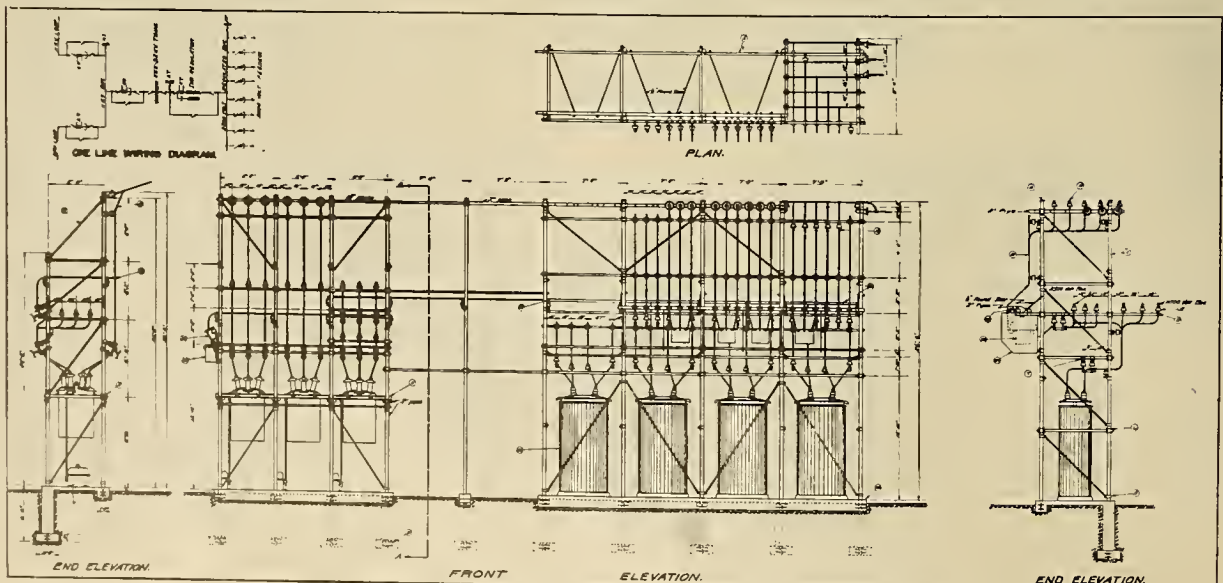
Details of bus and switch structure, Alta Vista substation.
